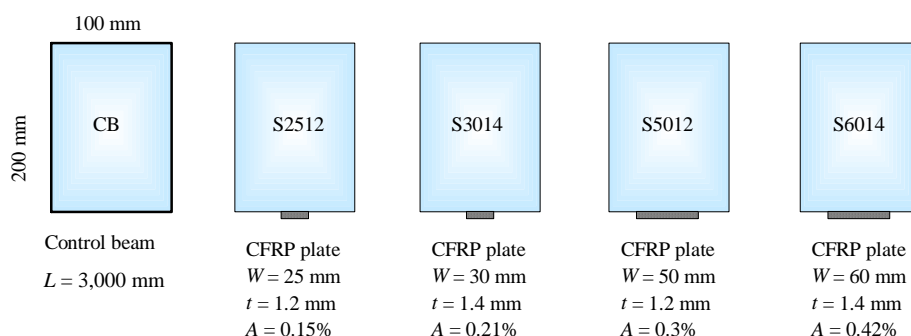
Cross section of beam strengthened using CFRP plates with different area.
